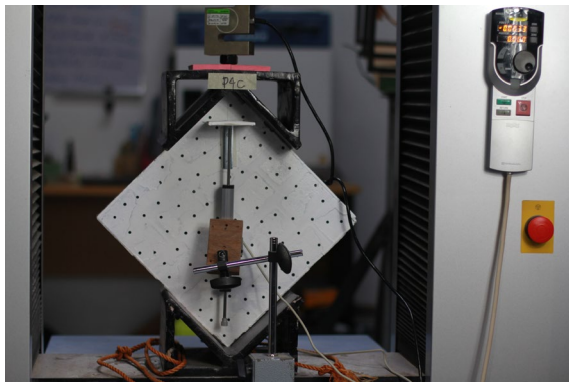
Masonry wallette with a specimen code P4c subjected to a diagonal test
